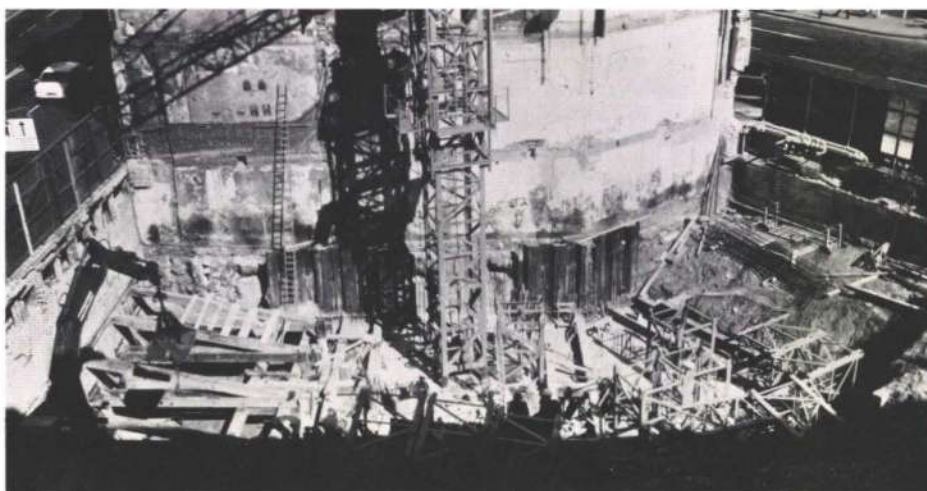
Phase I site during excavation seen from the top of offices across Bread Street. The temporary propping to the perimeter underpinning is visible on the left, and the beam of retaining material to the underpinning can be seen on the right. The flatjack thrust props to the sheet piling are in the middle around the crane. (Photo: Tony Dixon)
